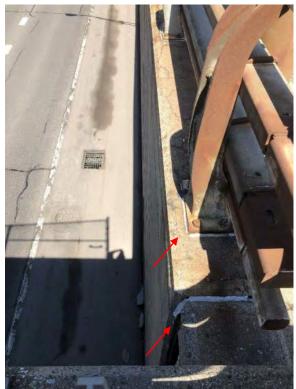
View of the 12" metal conduit associated with the 8" gas utility line where it penetrates the east abutment of BIN 1022630. The packing/sealant around the perimeter of the 12" conduit where it penetrates each abutment has been identified as an ACM.
